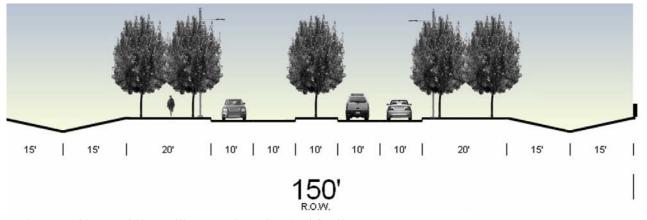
Stage 1 of the Multiway Boulevard Typical Section
